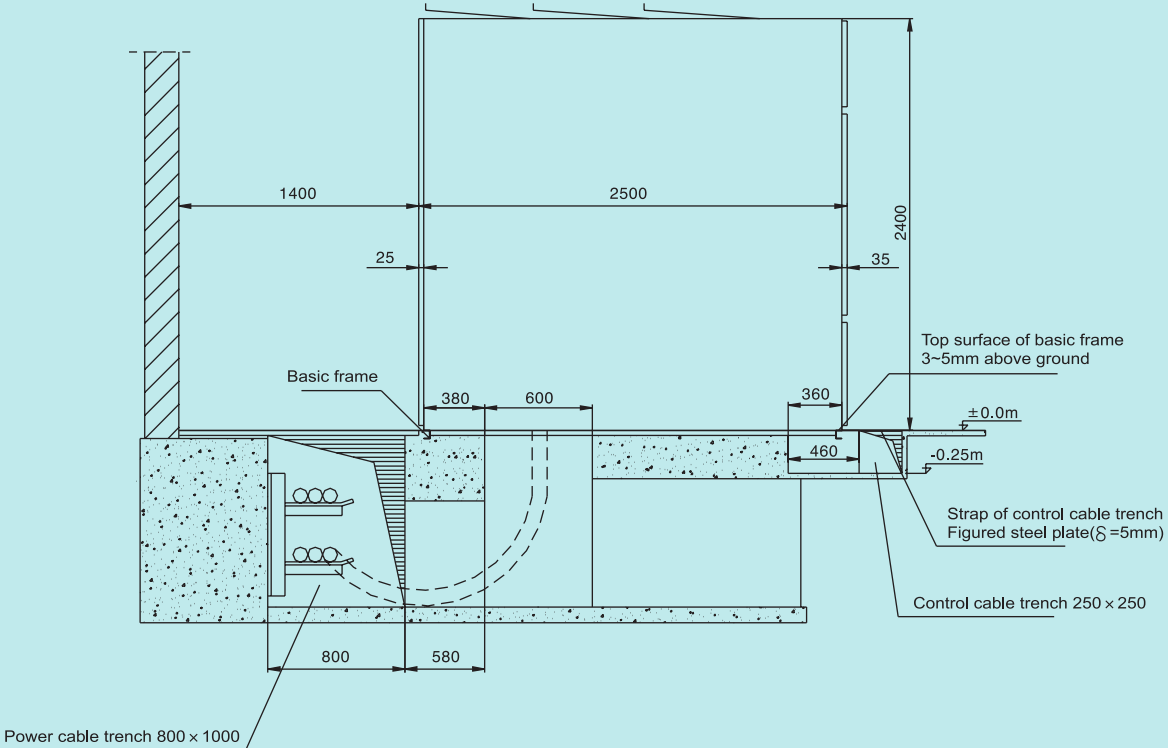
plane diagram for switchgear arrangement scheme (section A-A)
